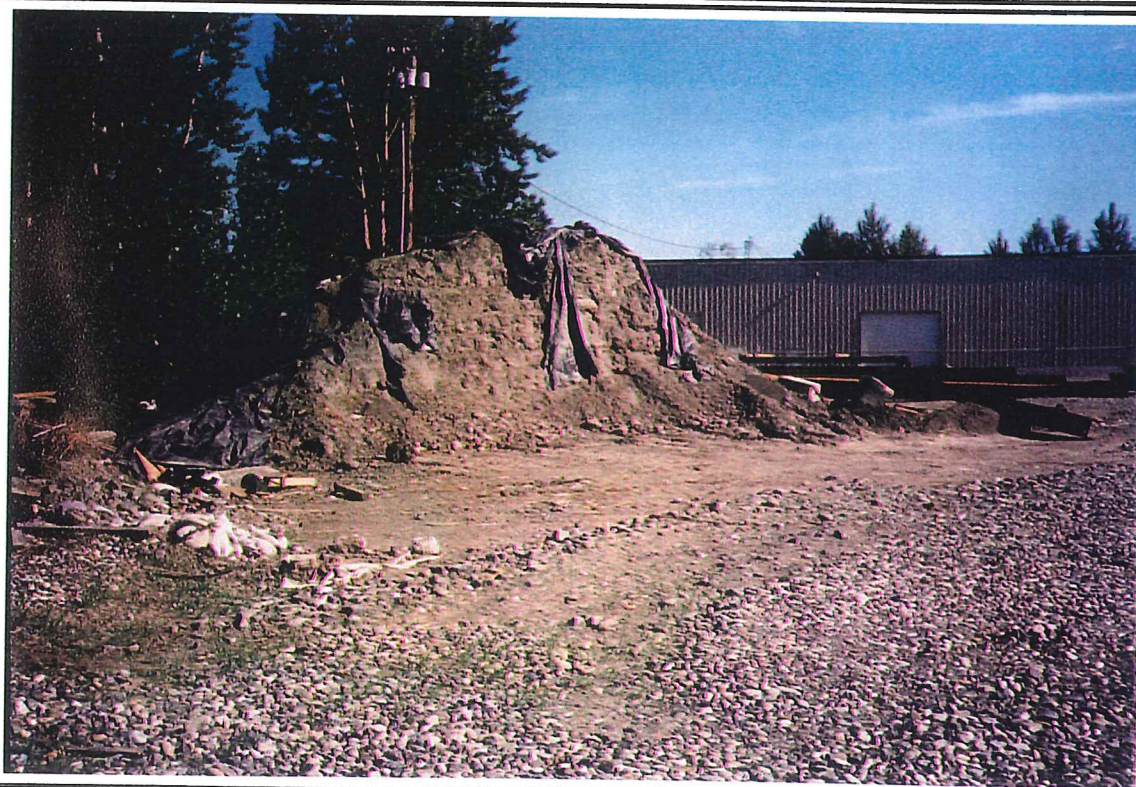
Final fill and grade located south of the Custom-Bilt Metals building, facing east. Photo taken on 6/20/02.
